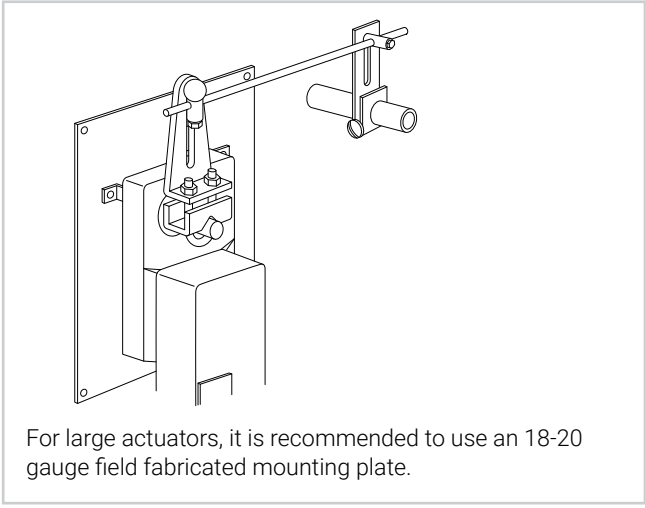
Actuator is mounted to the ductwork and connected to the jackshaft with crank arm kit
